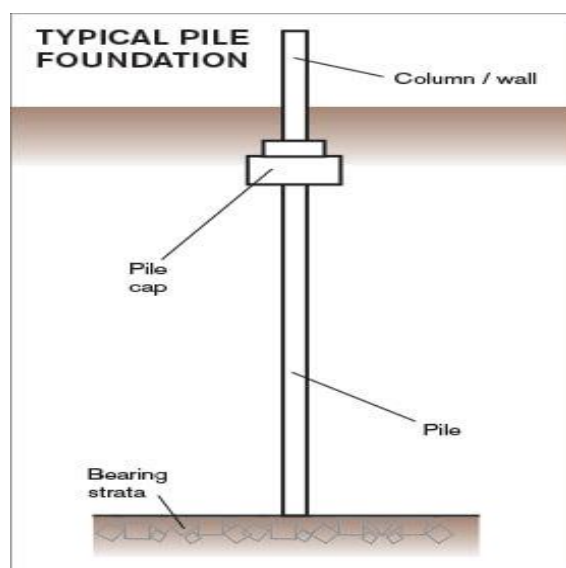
Typical Pile Foundation (Bowels, 1996).
